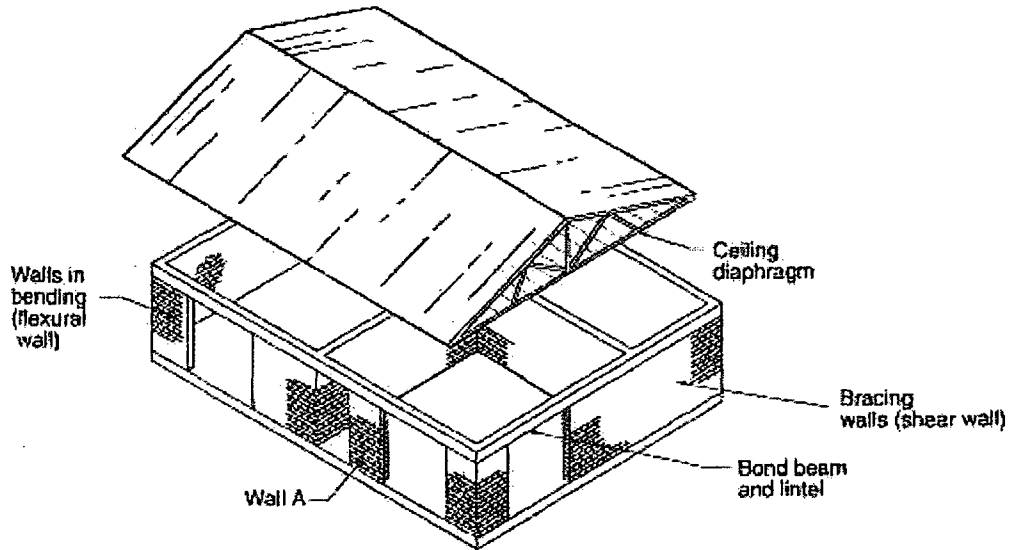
Lateral load resisting structural system of a single-storey masonry structure. (Drysdale and Hamid, 2005)
